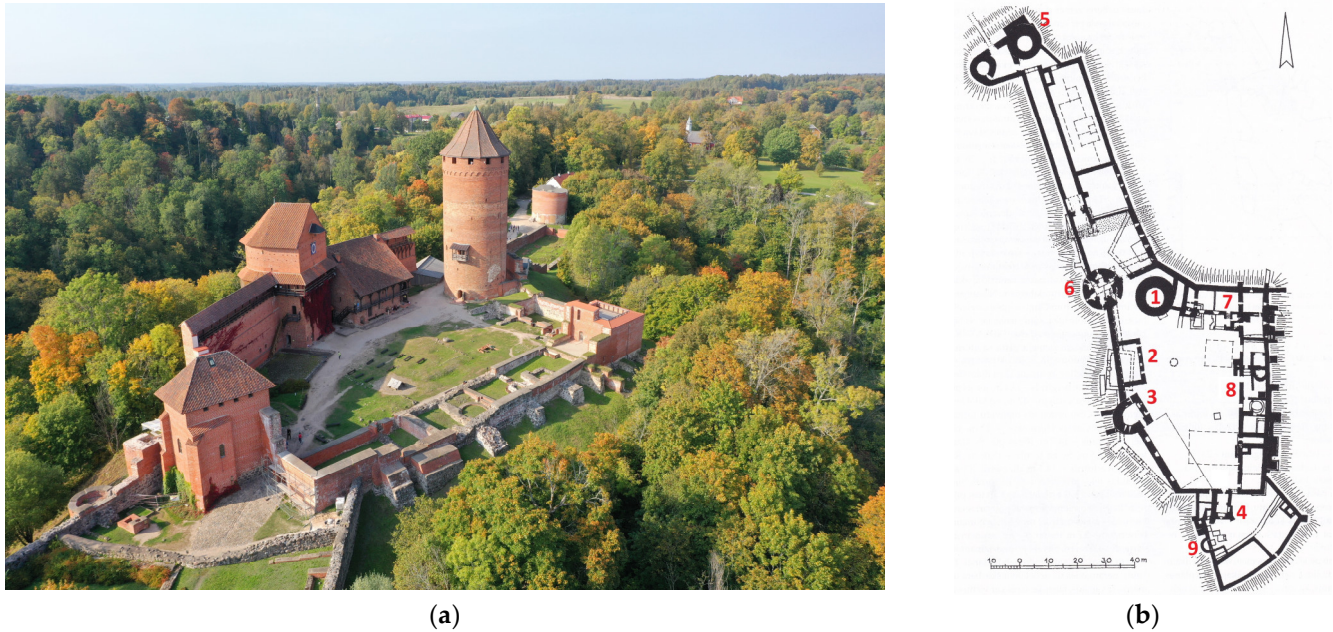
(a) Turaida Castle—view from south-east [21]. (b) Plan of Turaida Castle with restored buildings: 1—Main Tower; 2—west block; 3—west tower; 4—south tower; 5—tower at the north outer gate; 6—tower at the north inner gate; 7—north block; 8—east block; 9—small semicircular west tower; drawn by Gunārs Jansons [17] (p. 107).
